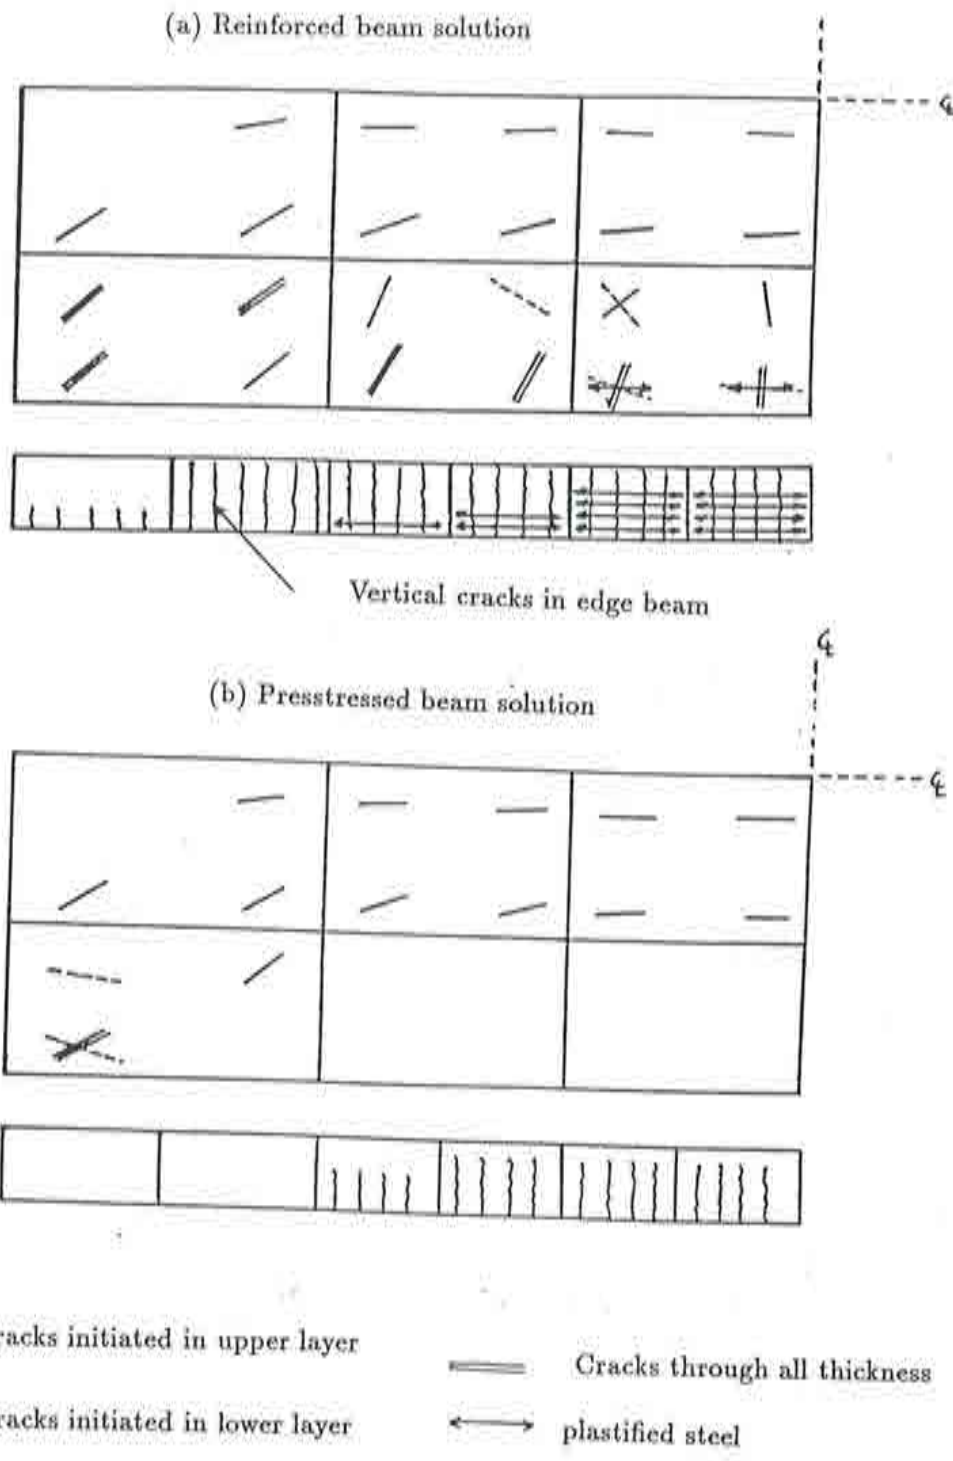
Cylindrical concrete shell. Crack patterns for reinforced steel and prestressing solutions.
